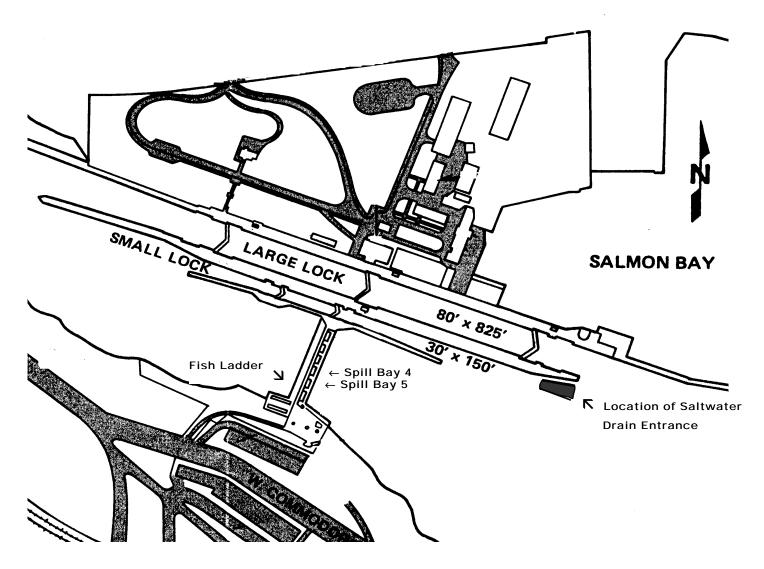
Plan view of the Hiram M. Chittenden Locks showing major structural features and location of tunnel readers in spill bays 4 and 5.
